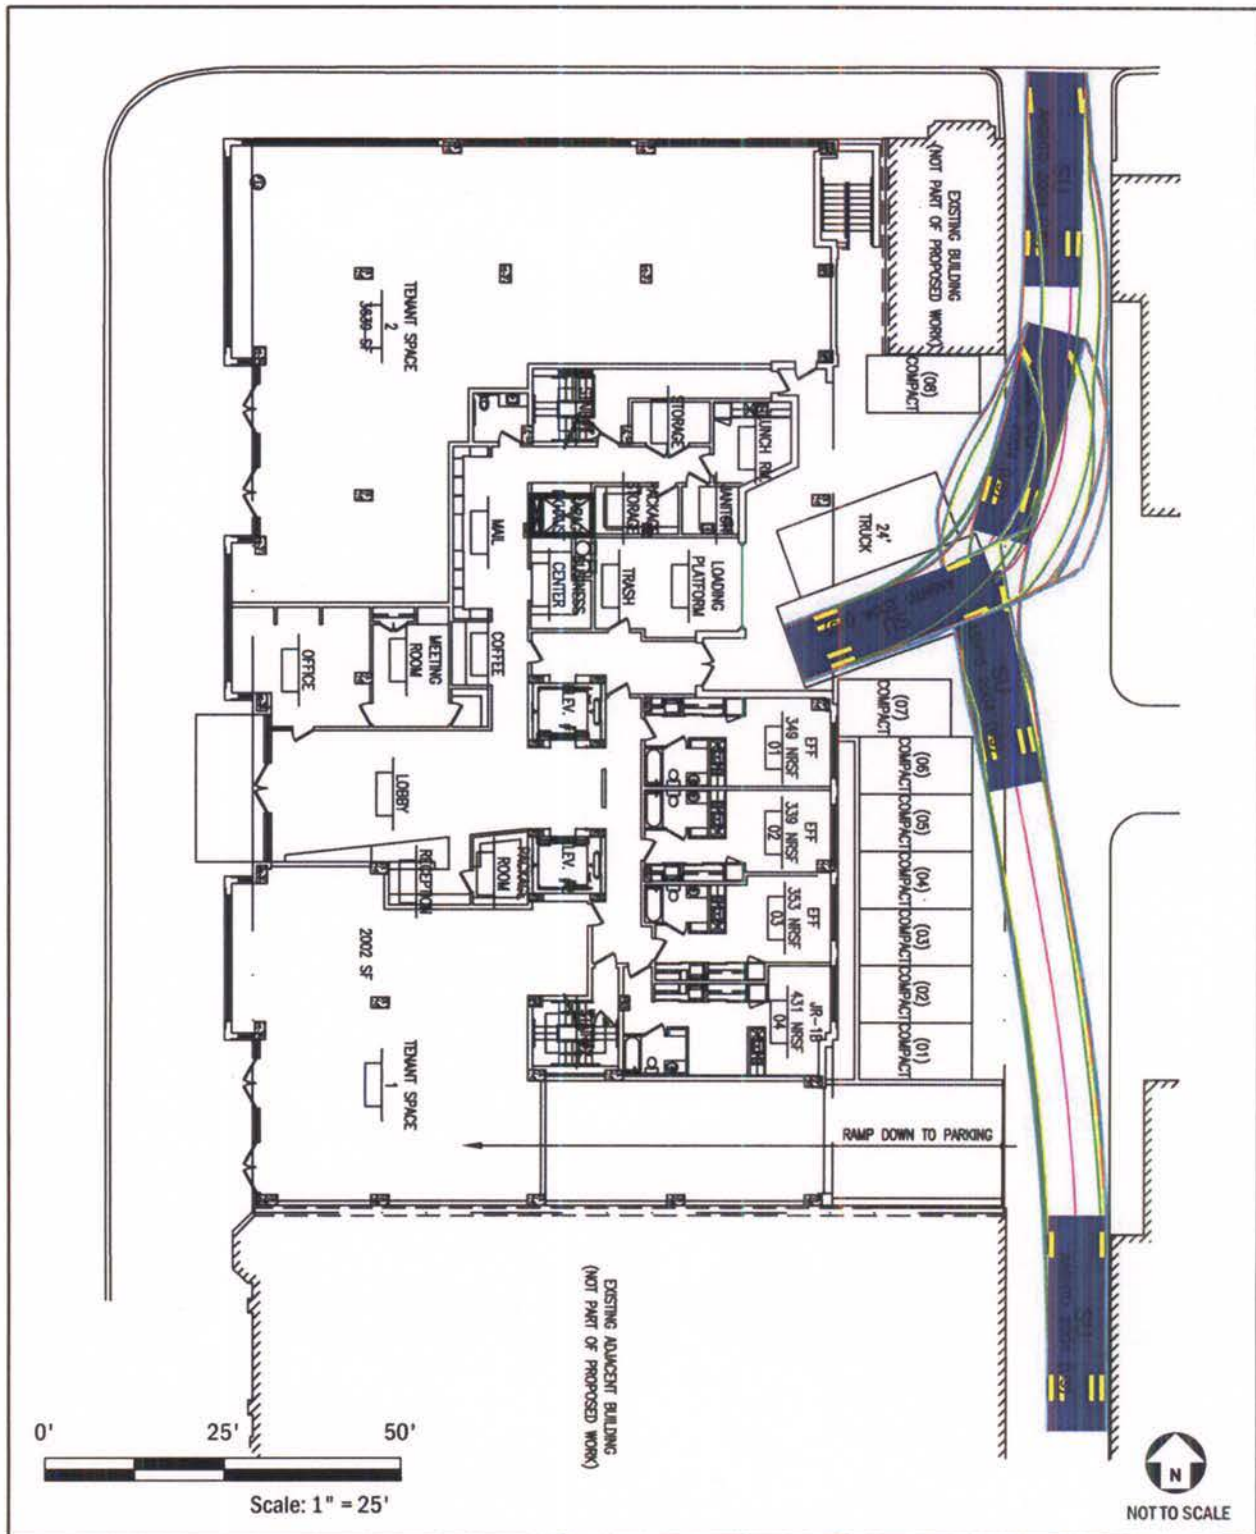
Delivery Vehicle (SU-30) Path Inbound from T Street, Outbound to Wallach Place
